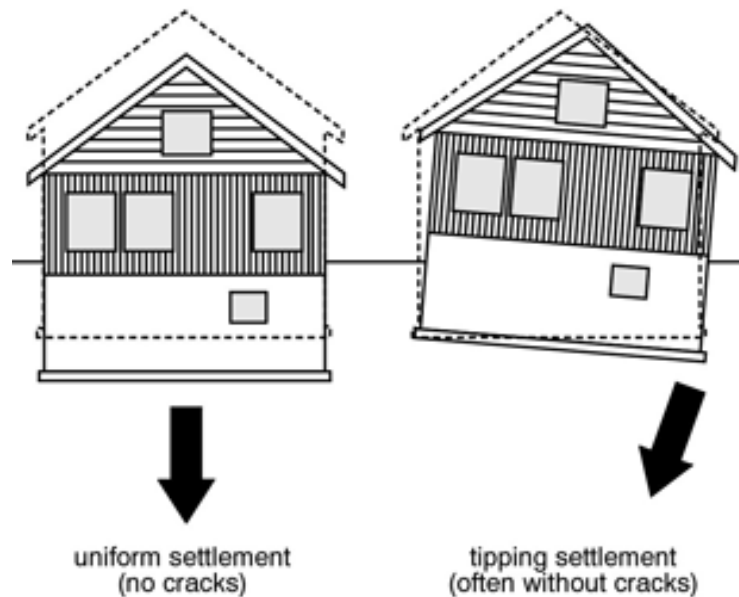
Concrete slab foundation, types of settlement. Source: (LSY consultants, 2017).
